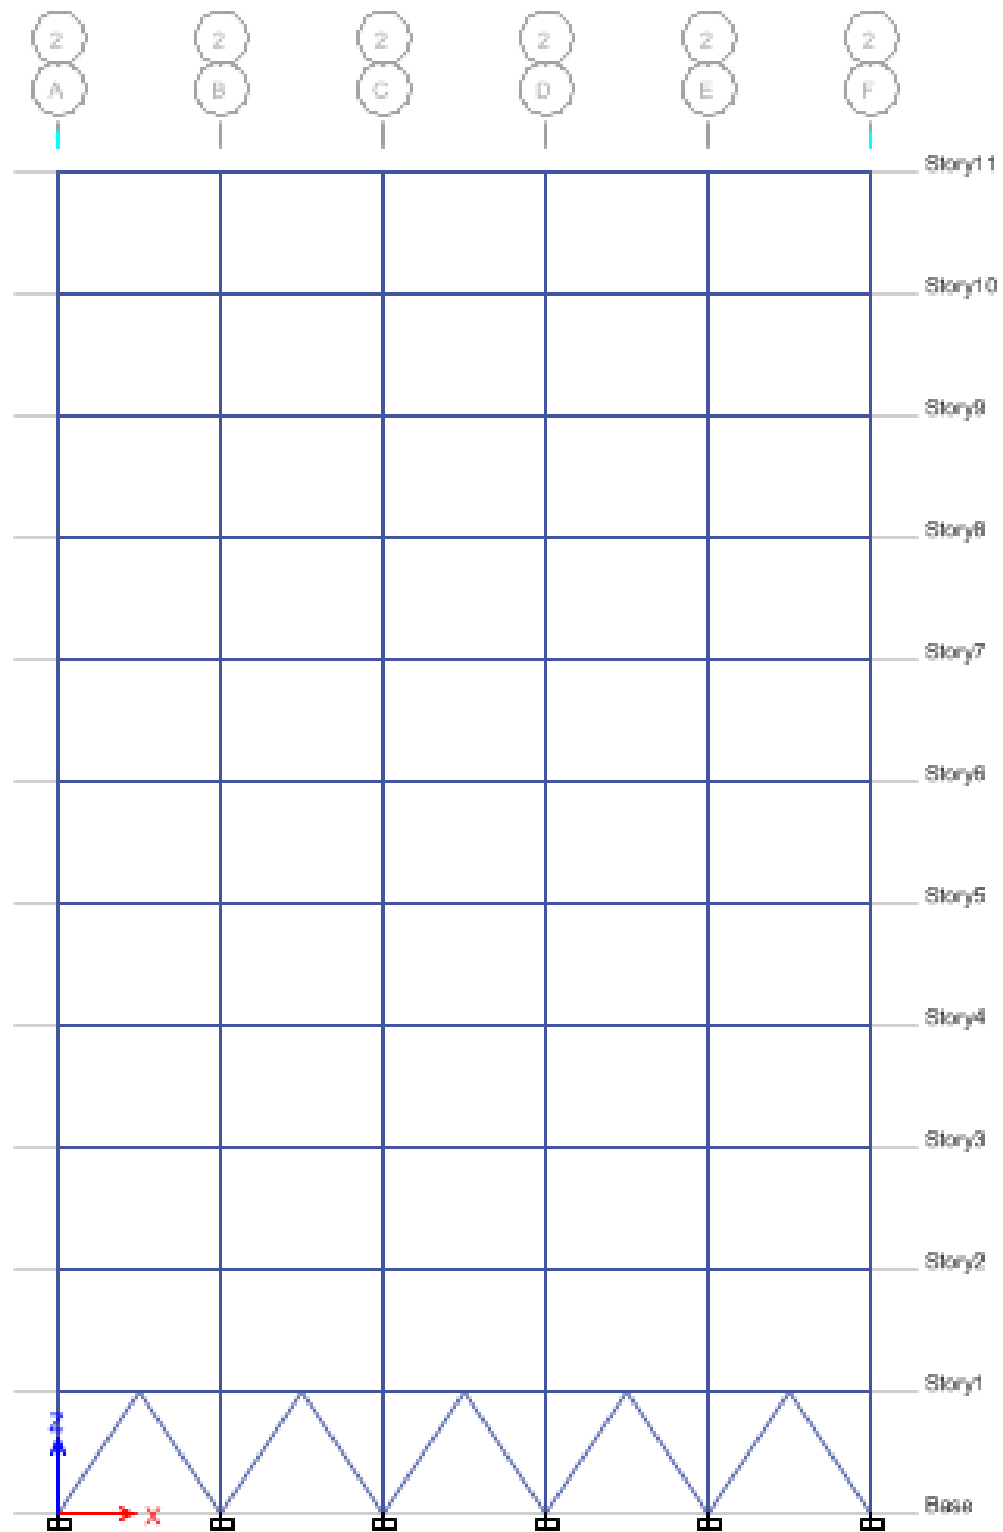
Elevation of Building Having Inverted V Bracing in Ground
